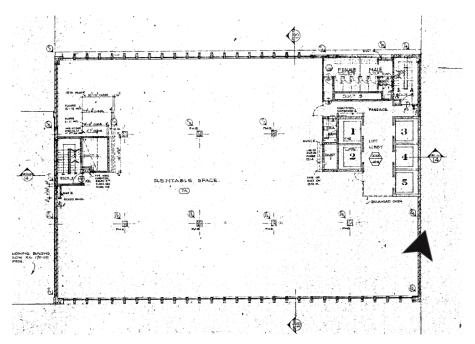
A 'typical floorplan for the 2nd-14th floors. Drawing dated 1968 (BAP).
